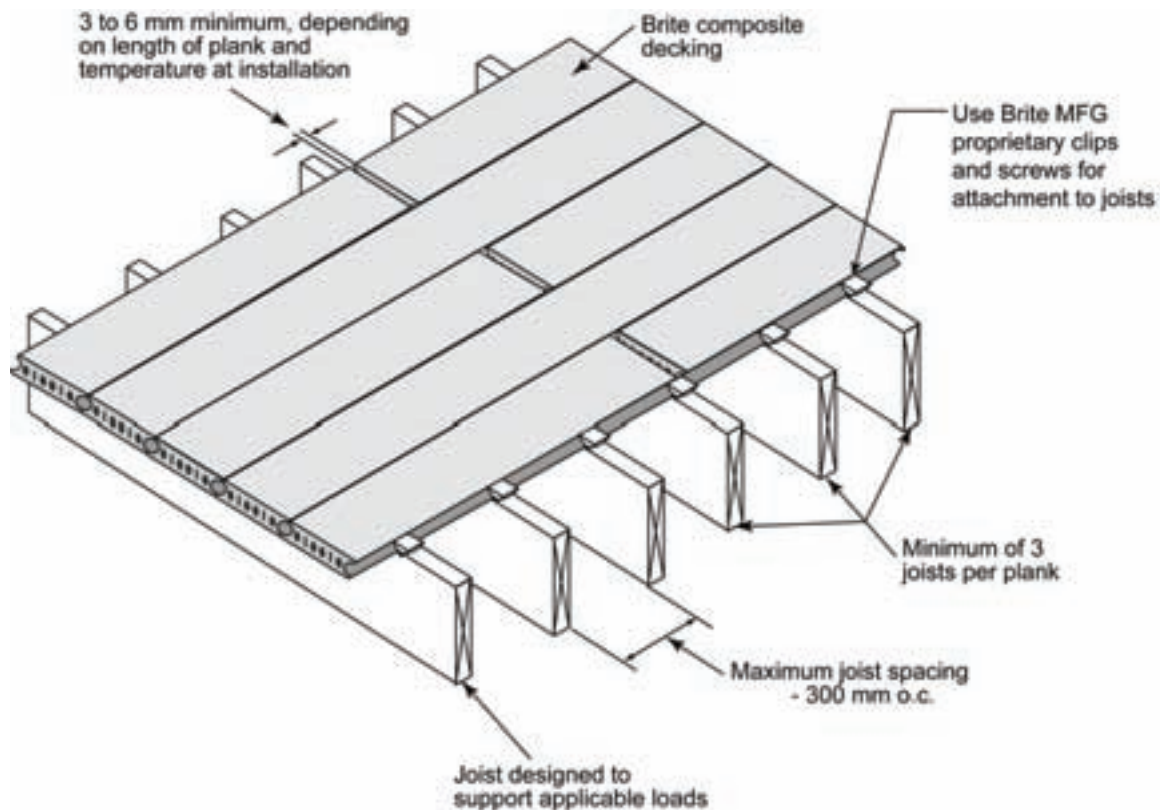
Installation of "Brite Composite Decking (Hollowcore)" Decking
